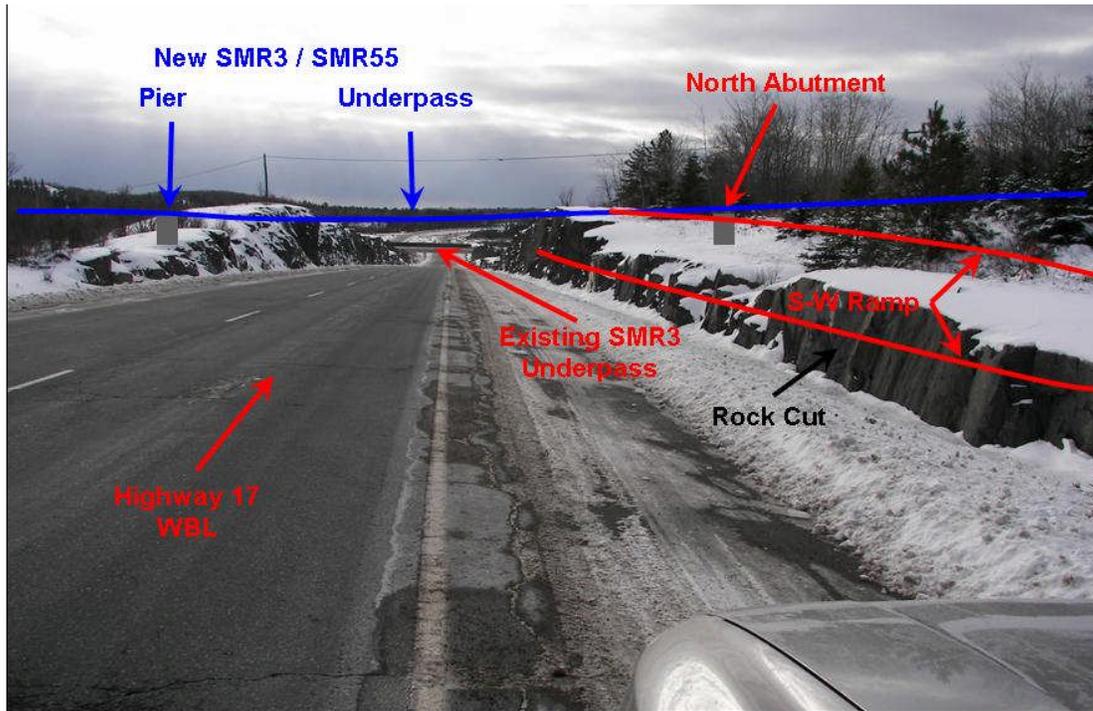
VIEW: Looking east from north shoulder of Highway 17 WBL about 800 m east of existing SMR3 underpass. New E-N/S ramp will cross a zone of shallow bedrock opposite existing rock cuts in the median. (Dec. 6, 2007)
